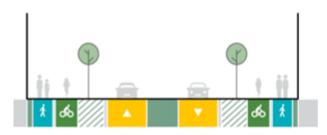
CFAF Outcome - New Connection between Milldale and Grand Drive indicative 24 m cross section
